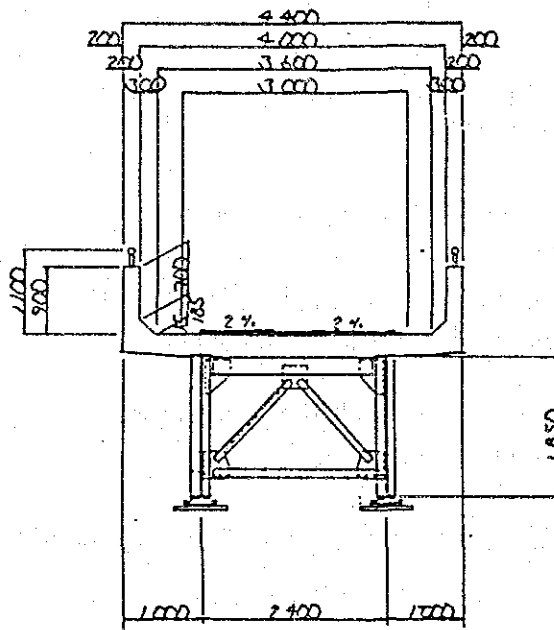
Cross Section of Steel Composite Plate Girder
